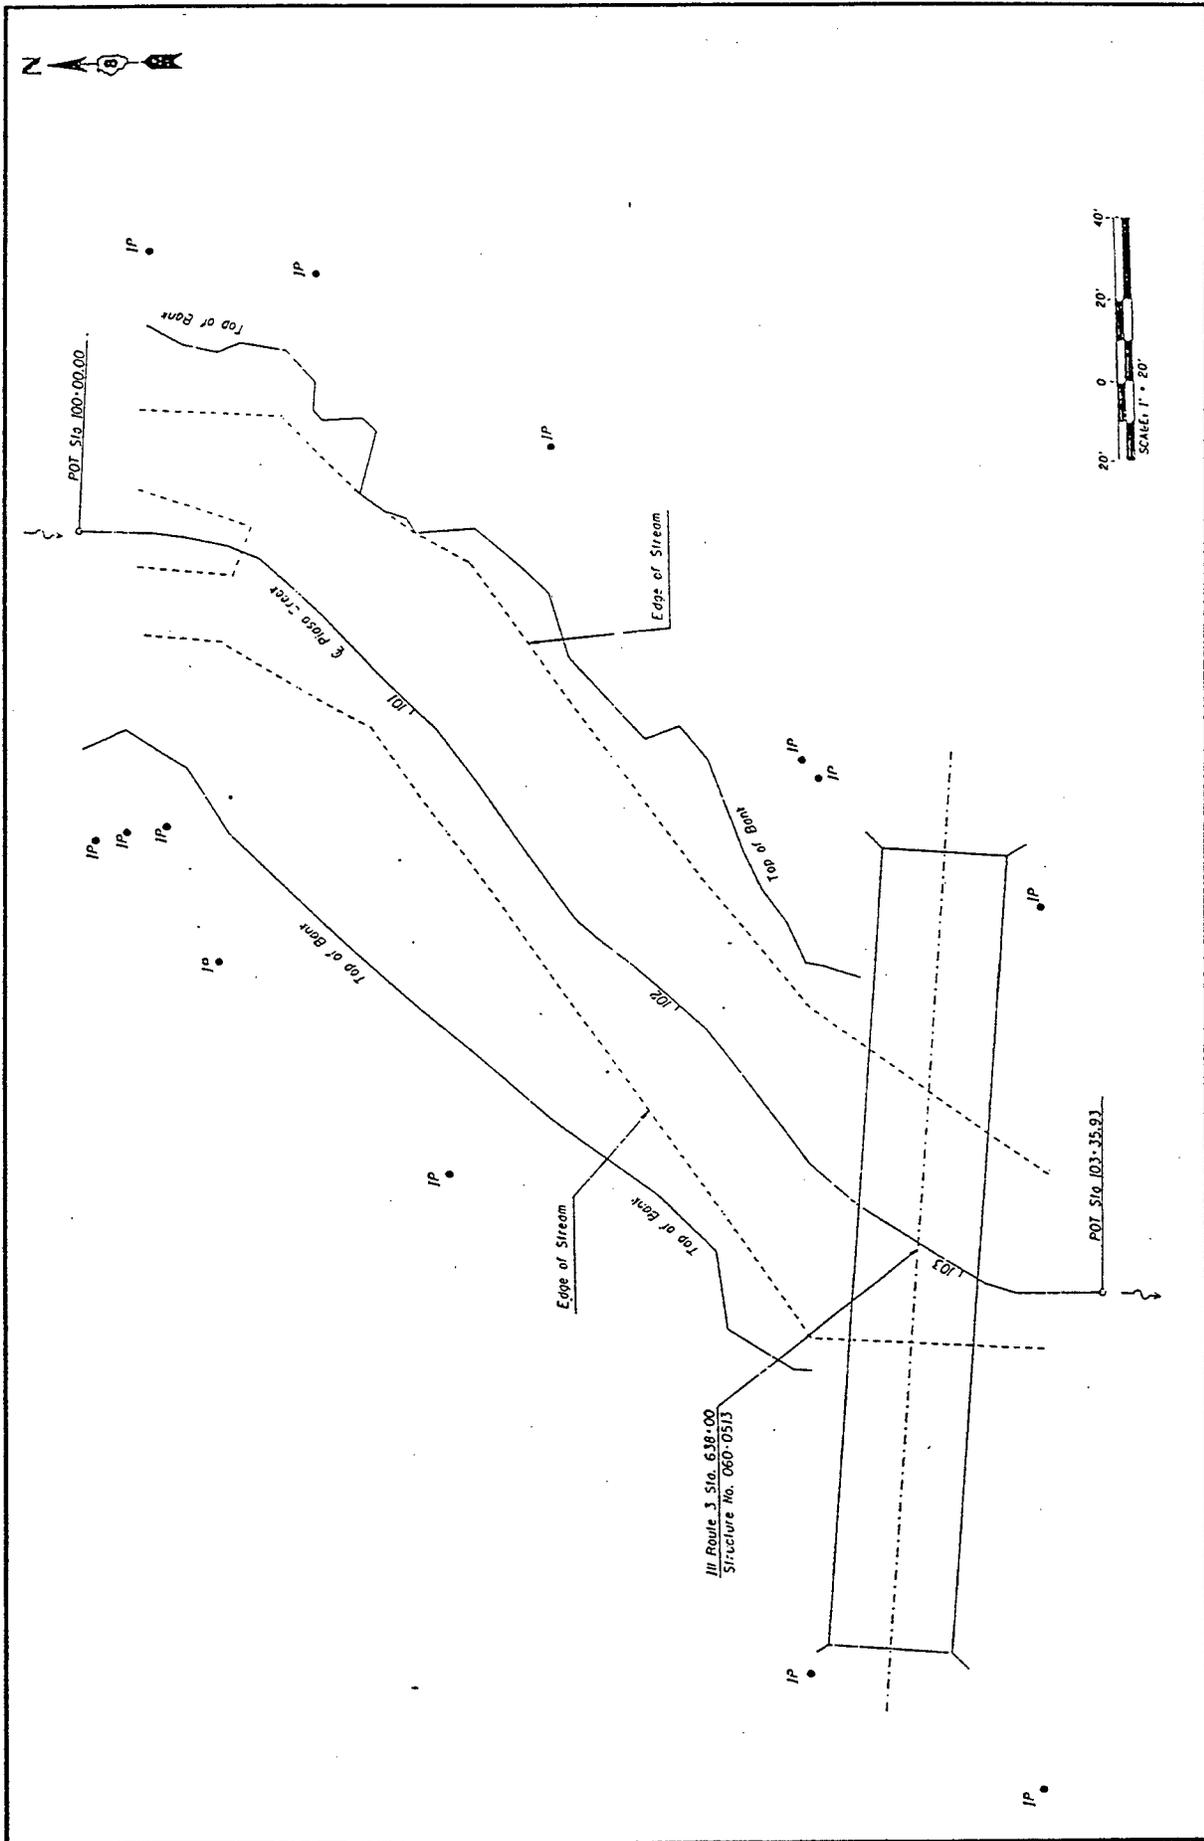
Plan survey of Piasa Creek, July 1996. (Source: IDOT)
